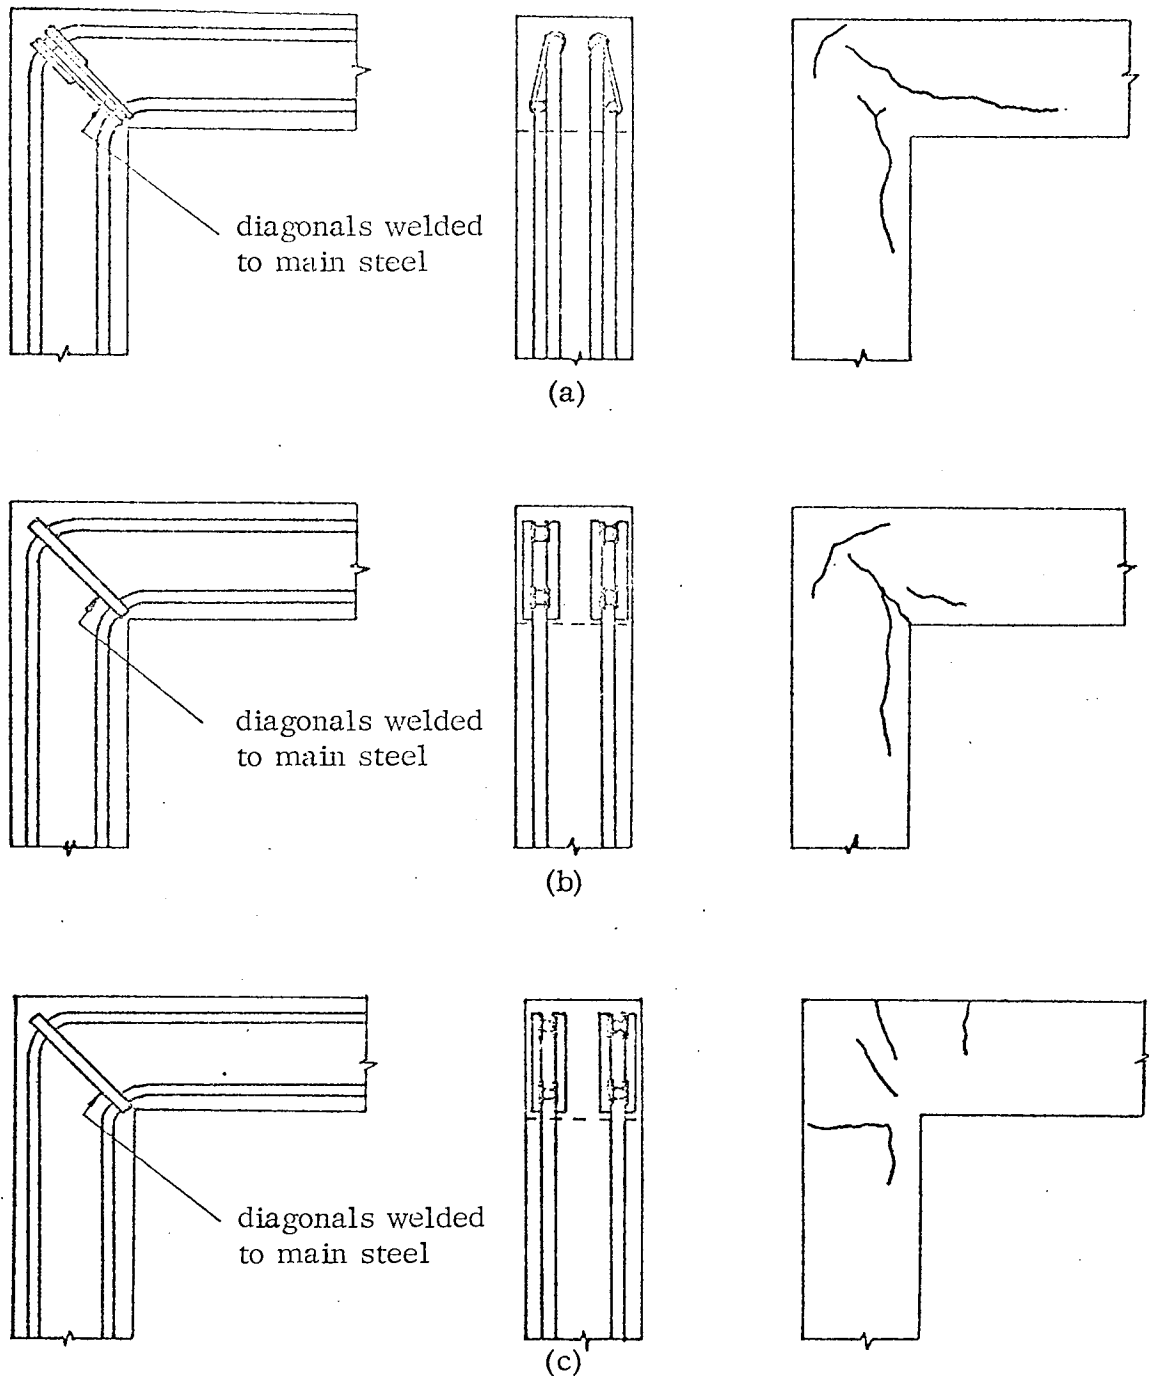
Reinforcement details and major crack patterns of best test specimens by Swann
